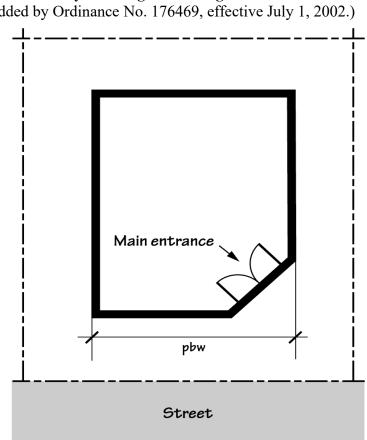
Primary Building Wall - Angled Entrance (Added by Ordinance No. 176469, effective July 1, 2002.)
